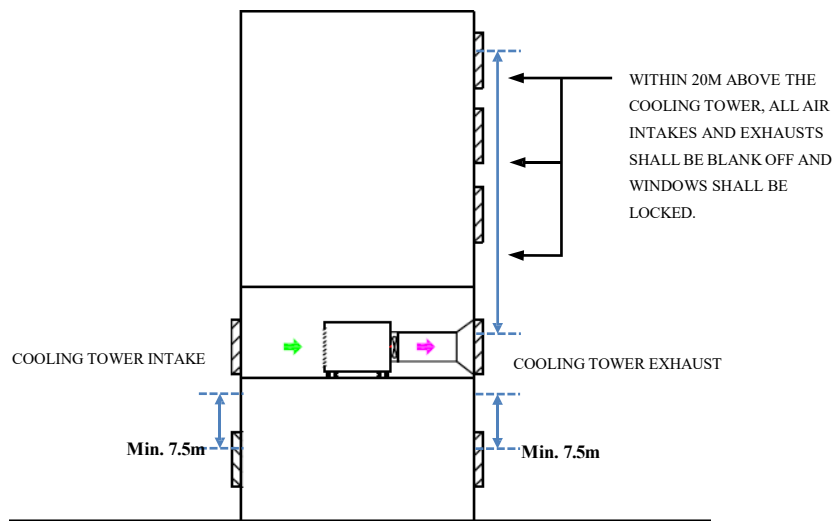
Cooling tower installed in indoor with separation from air intakes and exhausts and operable windows on its vertical building façade by minimum 7.5m below or 20m above.
